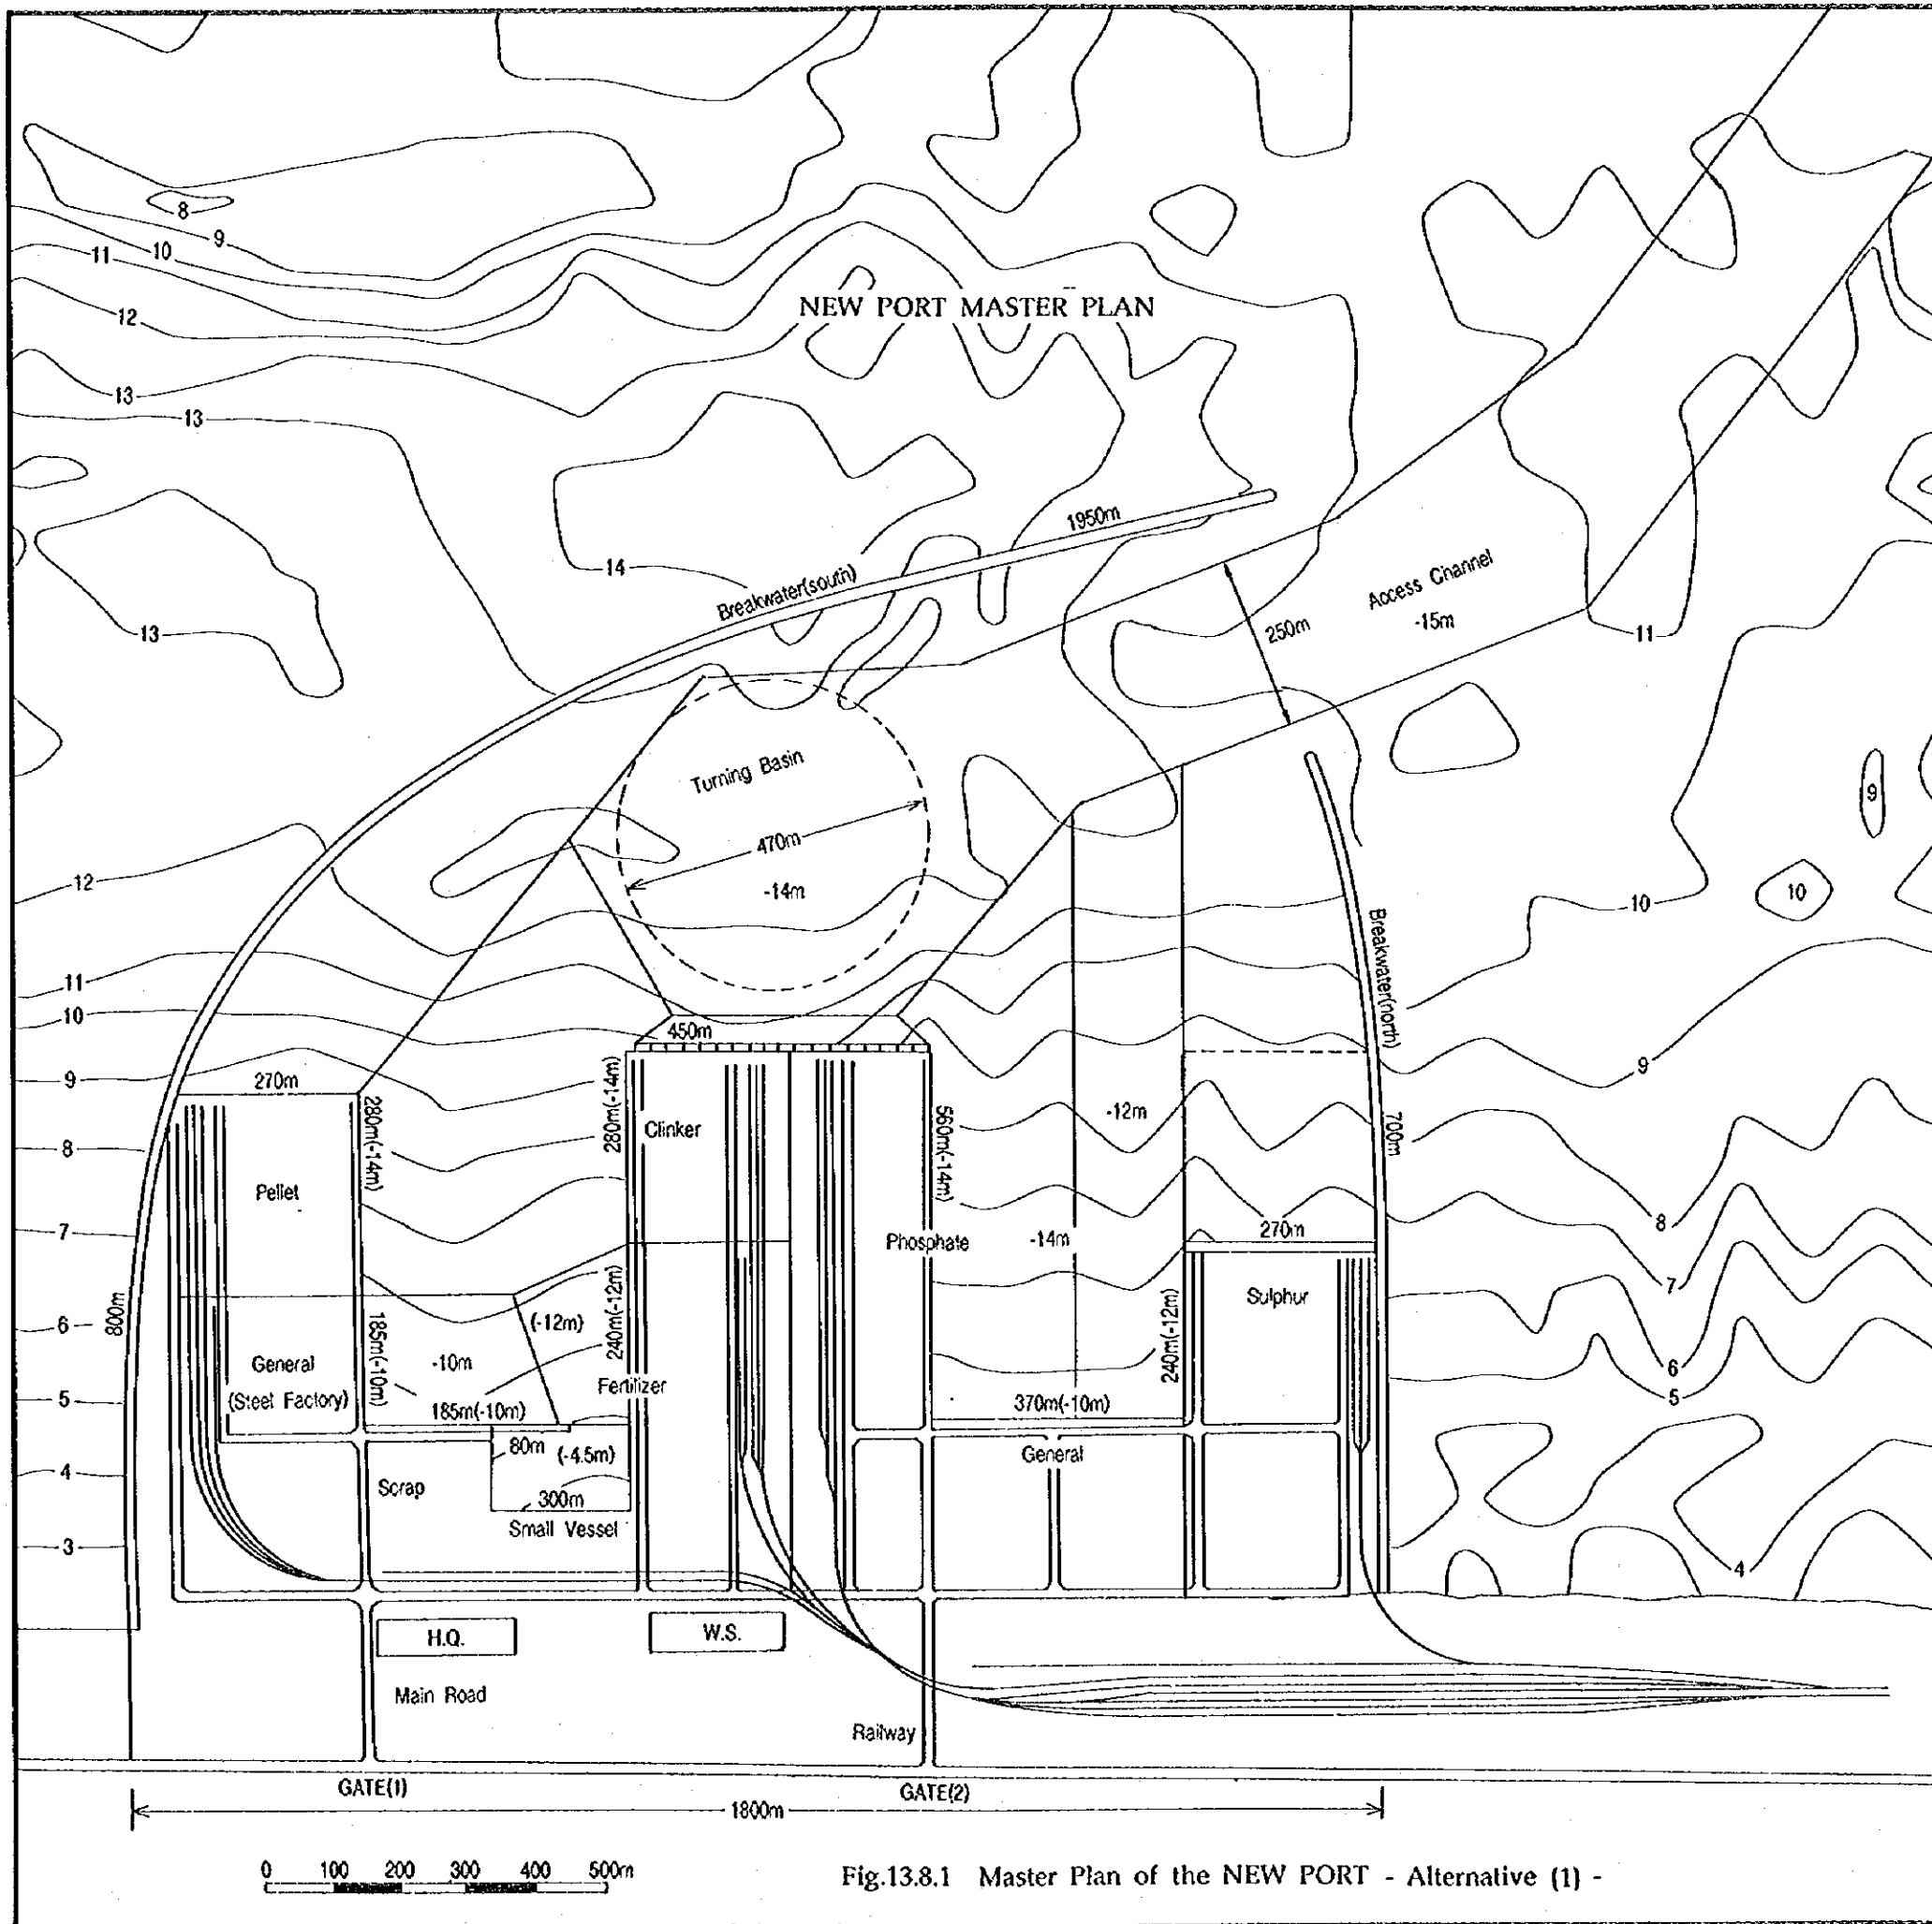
Master Plan of the NEW PORT - Alternative (1) -
